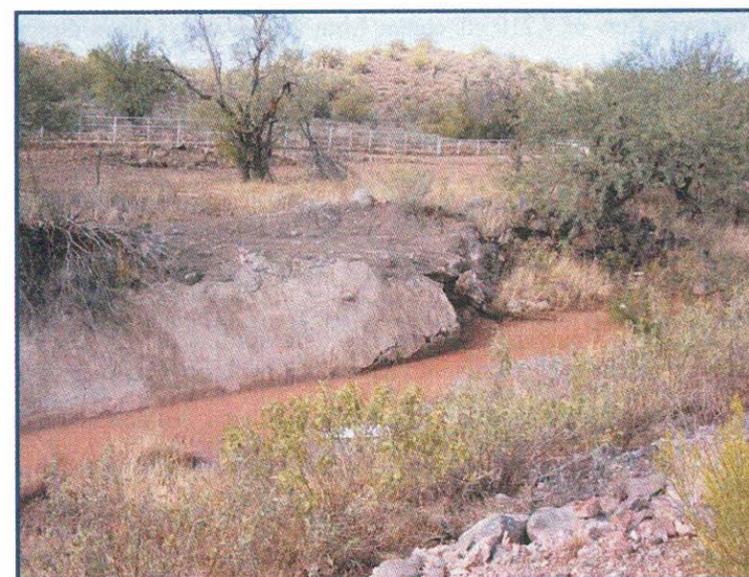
Rodger Creek Crossing Erosion Damage at New River Road (9-19-04)
